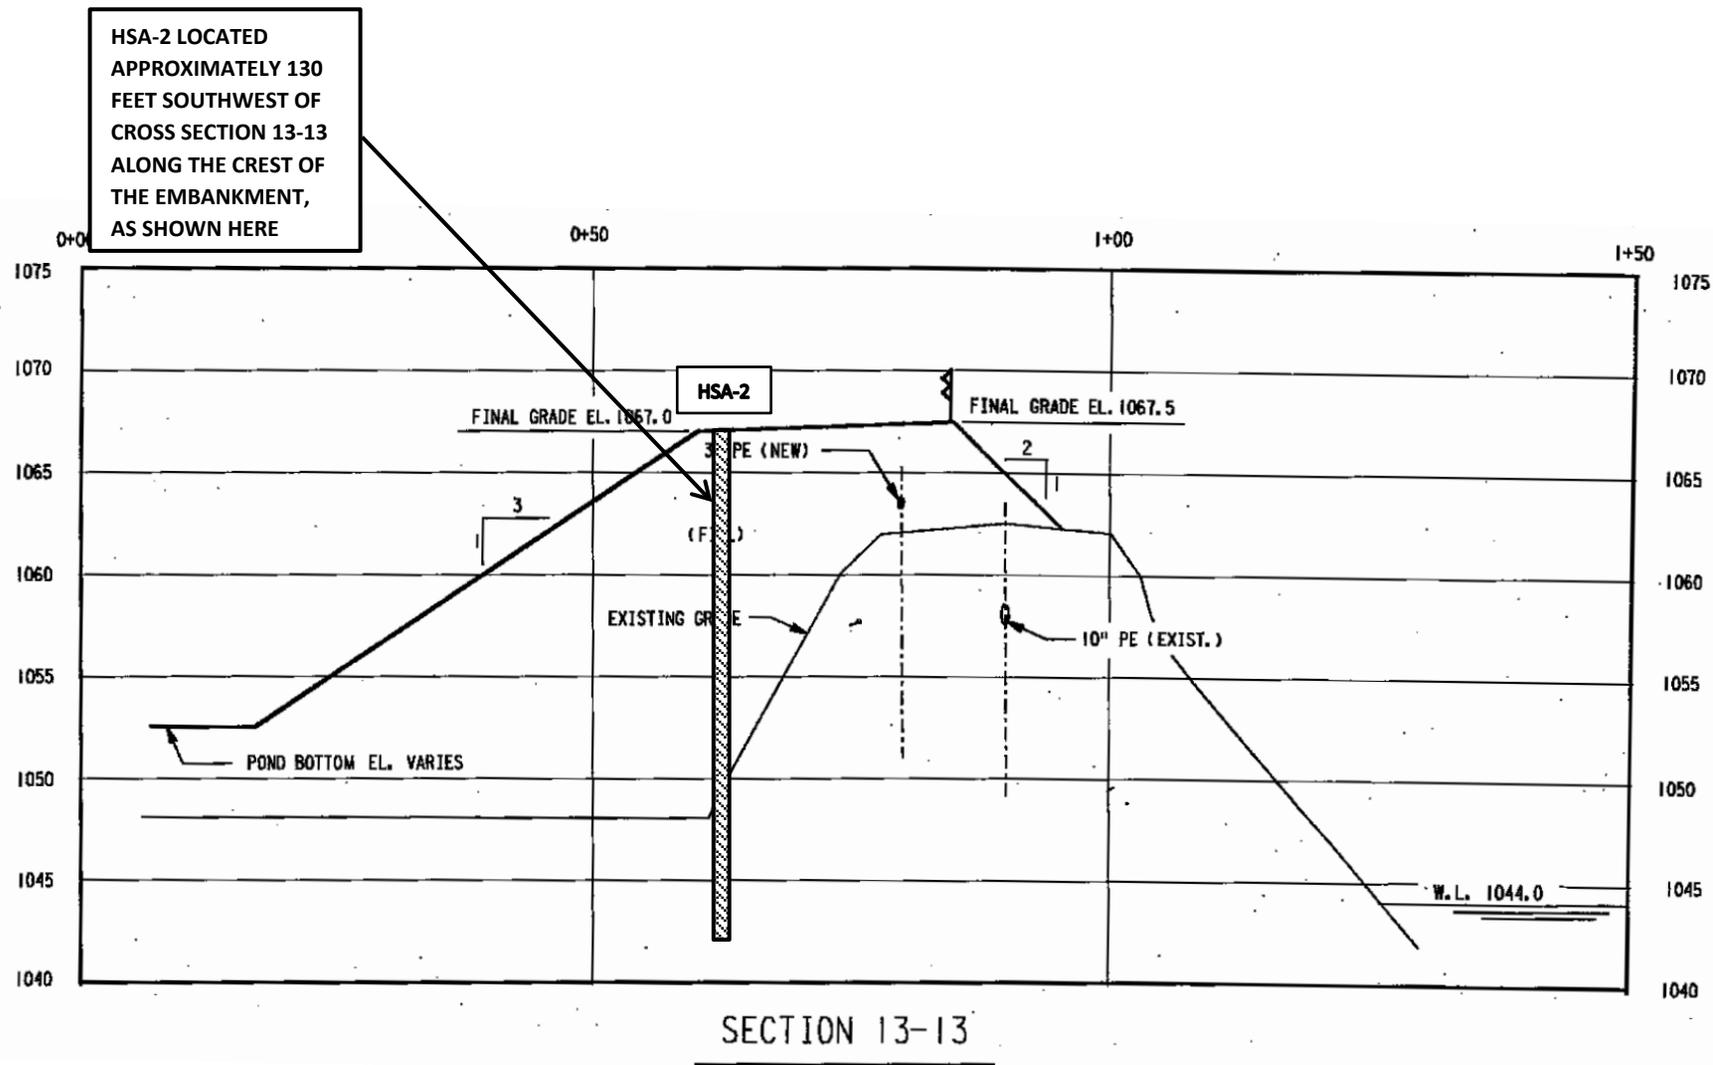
Cross Section 13-13 of the Northwest Berm of Ash Pond A
